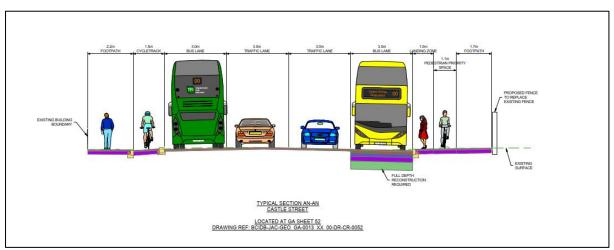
Extract from Typical Cross-section Drawings (Sheet 22)
